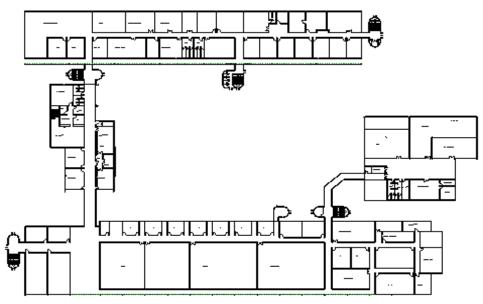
The First Floor Plan of the Faculty of Medicine, A.B.U Source: Author's sketch, 2016
